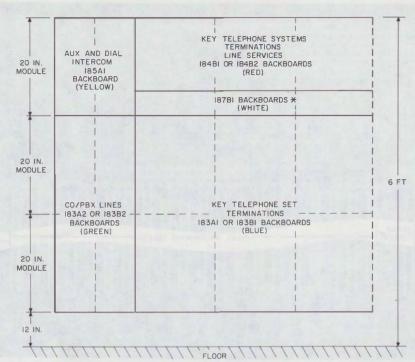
Typical Centralized Terminal Field Arrangement Using 180-Type Backboards, 66-Type Connecting Blocks, and 600-Series Modular Panels
